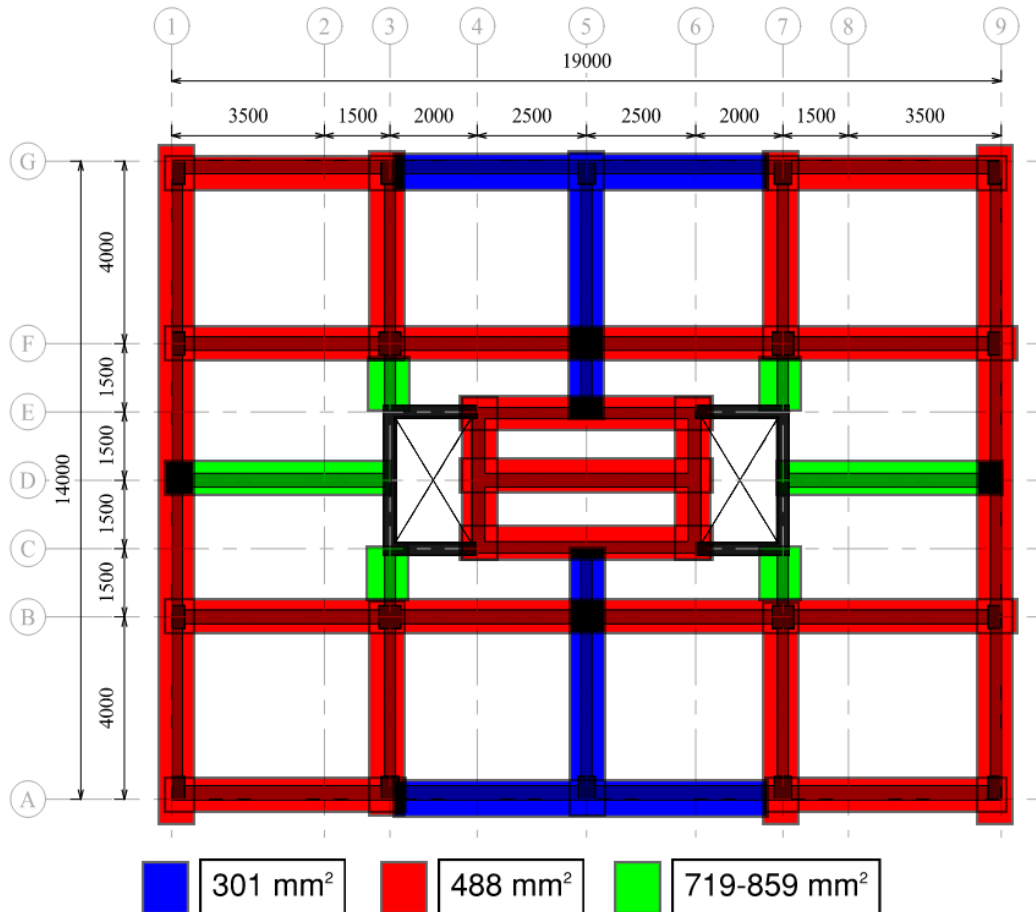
Twelve-story structure in Istanbul, beam reinforcement area groups per TEC 2007.
